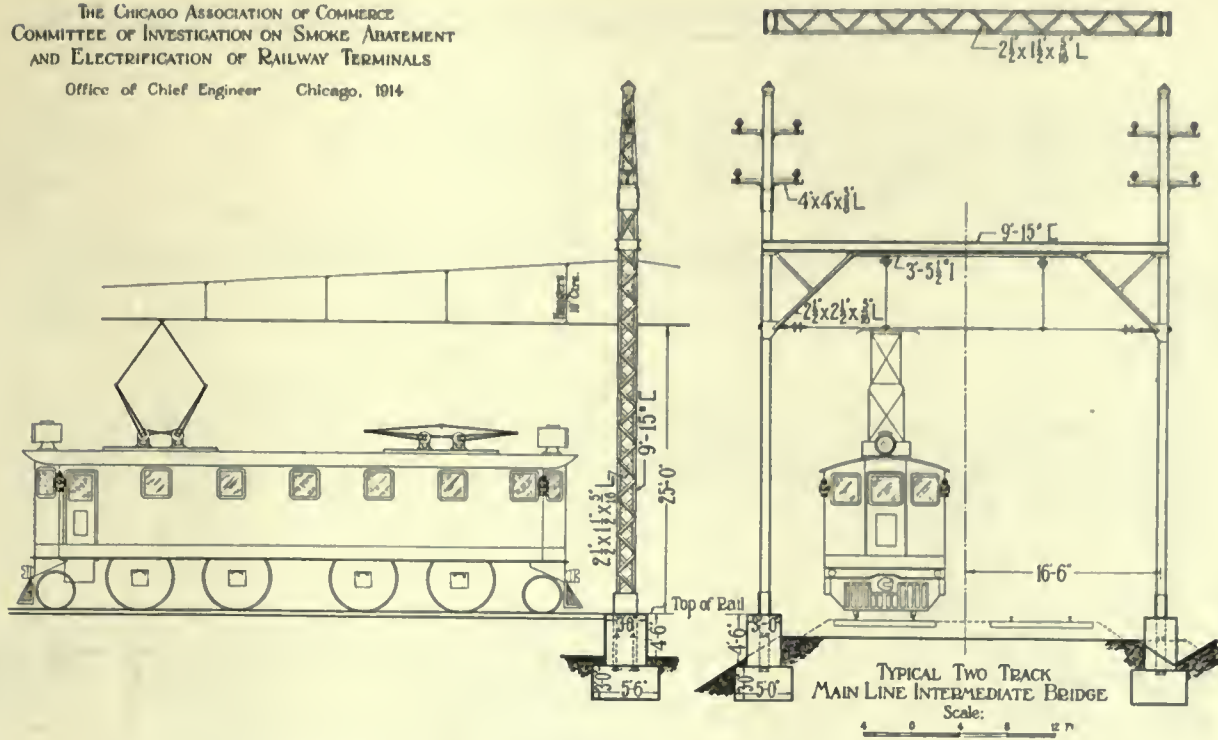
TYPICAL TWO TRACK STRUT BRIDGE WITH STRAIGHT POSTS
